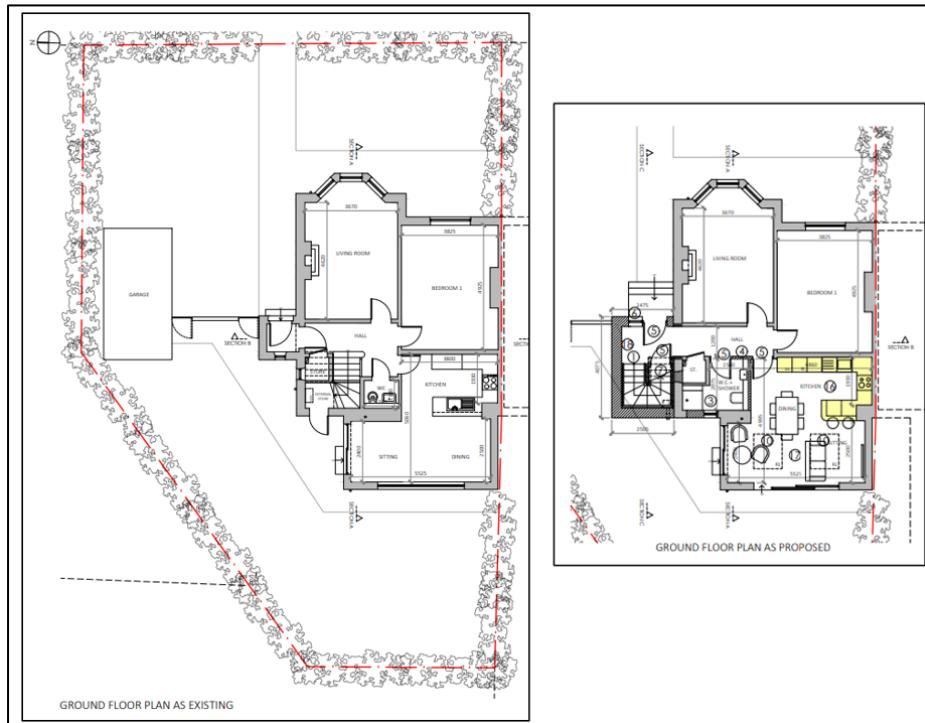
Existing and Proposed Ground Floor Plan – Showing the modest footprint extension to the rear of the existing side entrance.
